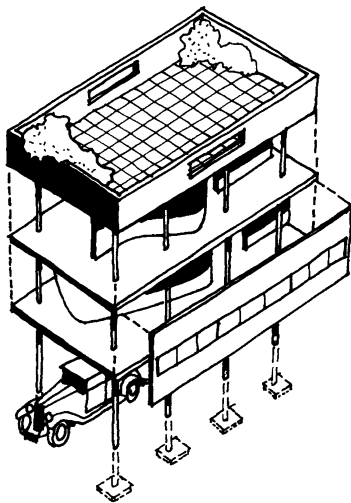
The Five Points, Reinforced Concrete House. Author's interpretation.
